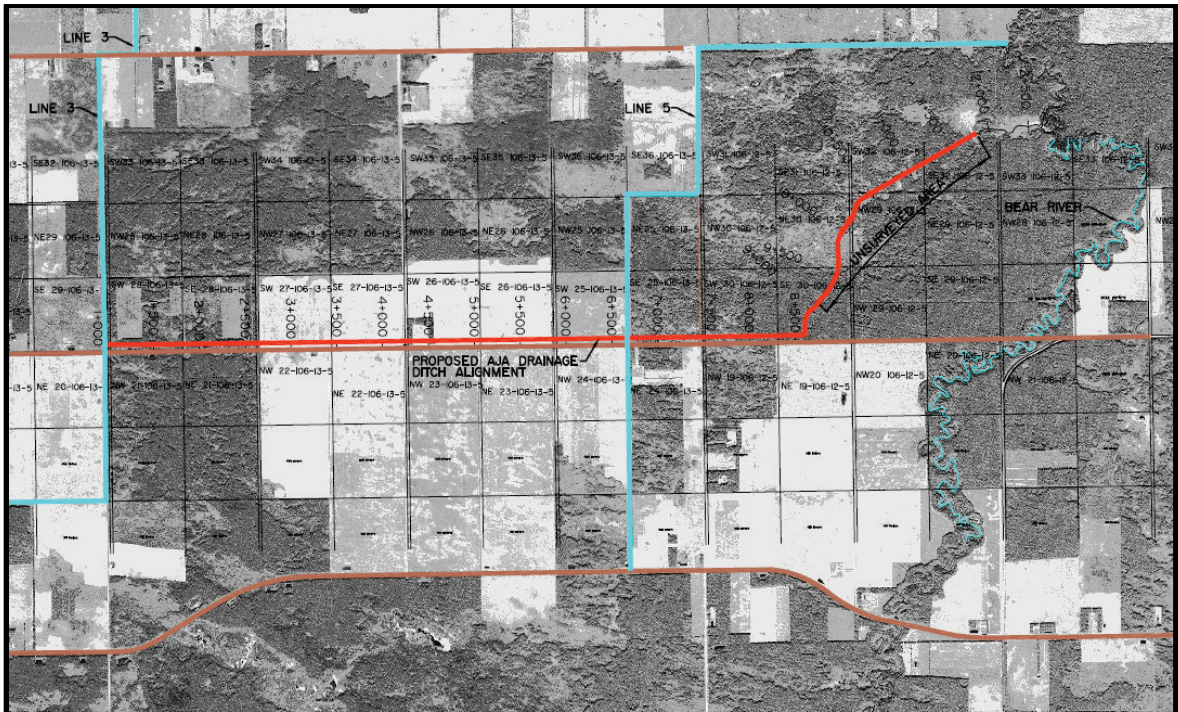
Conceptual plan for the AJA Friesen drainage ditch project
